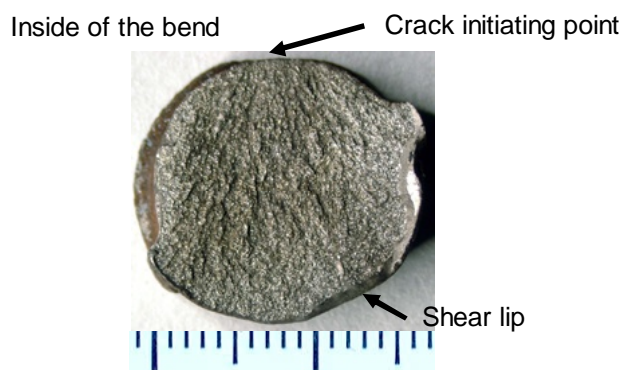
Macro View of Fracture Surface of Fractured Reinforcing Steel (D16)
